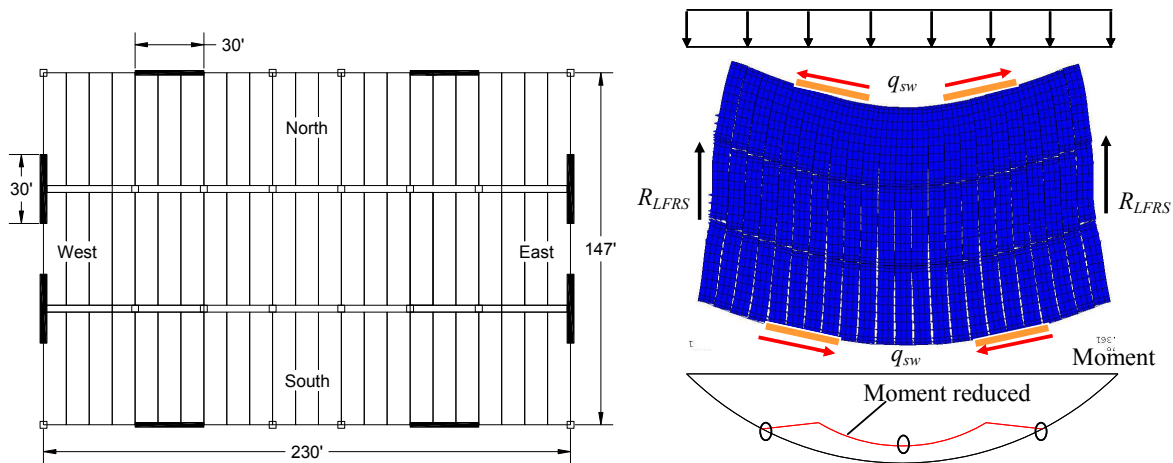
8-story parking garage with perimeter shear walls: (a) Plan; (b) FBD.
